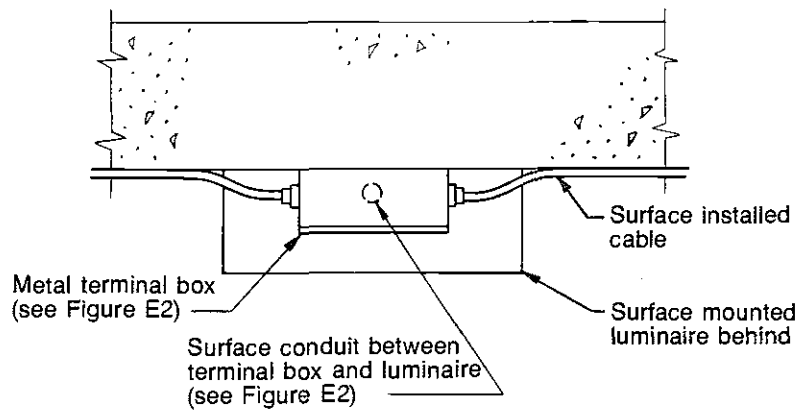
TYPICAL LAYOUT OF SURFACE INSTALLED CABLE, SURFACE MOUNTED TERMINAL BOX AND SURFACE MOUNTED LUMINAIRE
